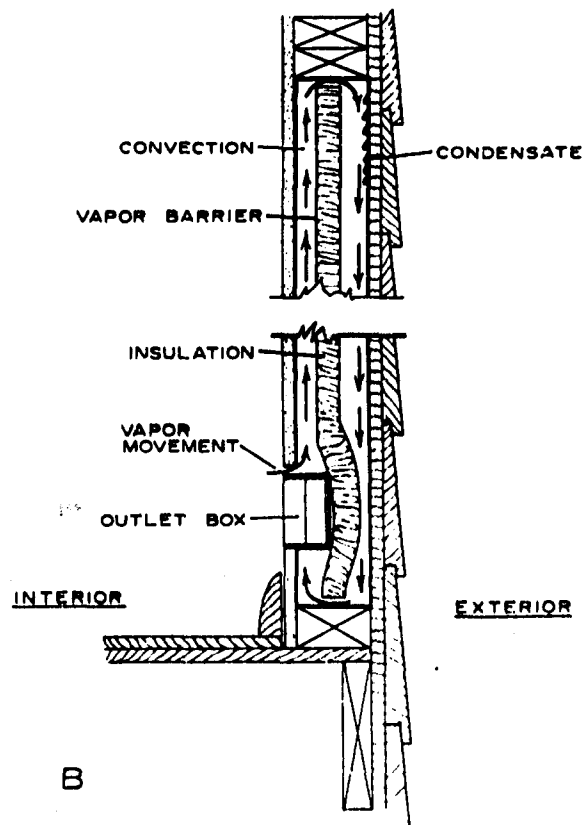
Results of water vapor loss around outlet box. M 139 215
